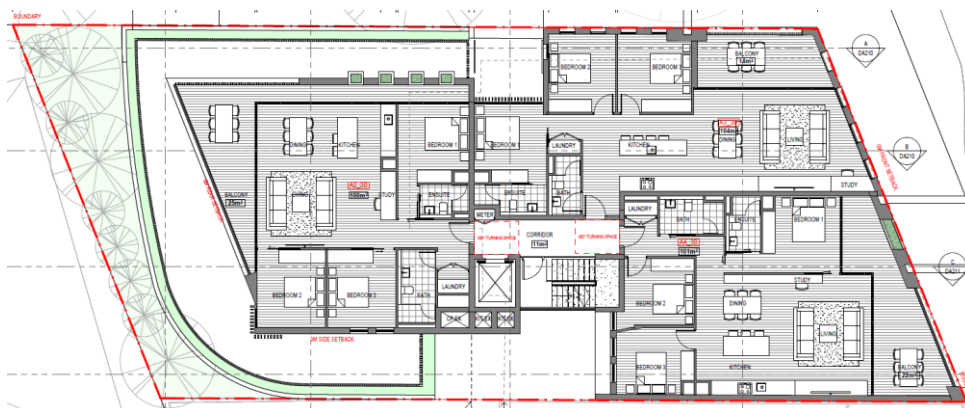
Originally proposed level 2 floor plan under the subject DA - 18-20A Perouse Road, Randwick (Source: Curzon & Partners)
